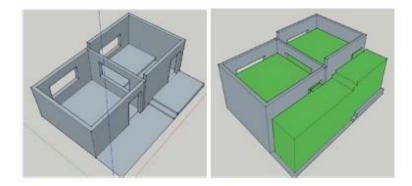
Left: Two rooms connected through an open window and a corridor. Corridor and right room consists of a step in each. Right: Navigable 3D space (in green) for a walking person (Khan and Kolbe, 2013).
